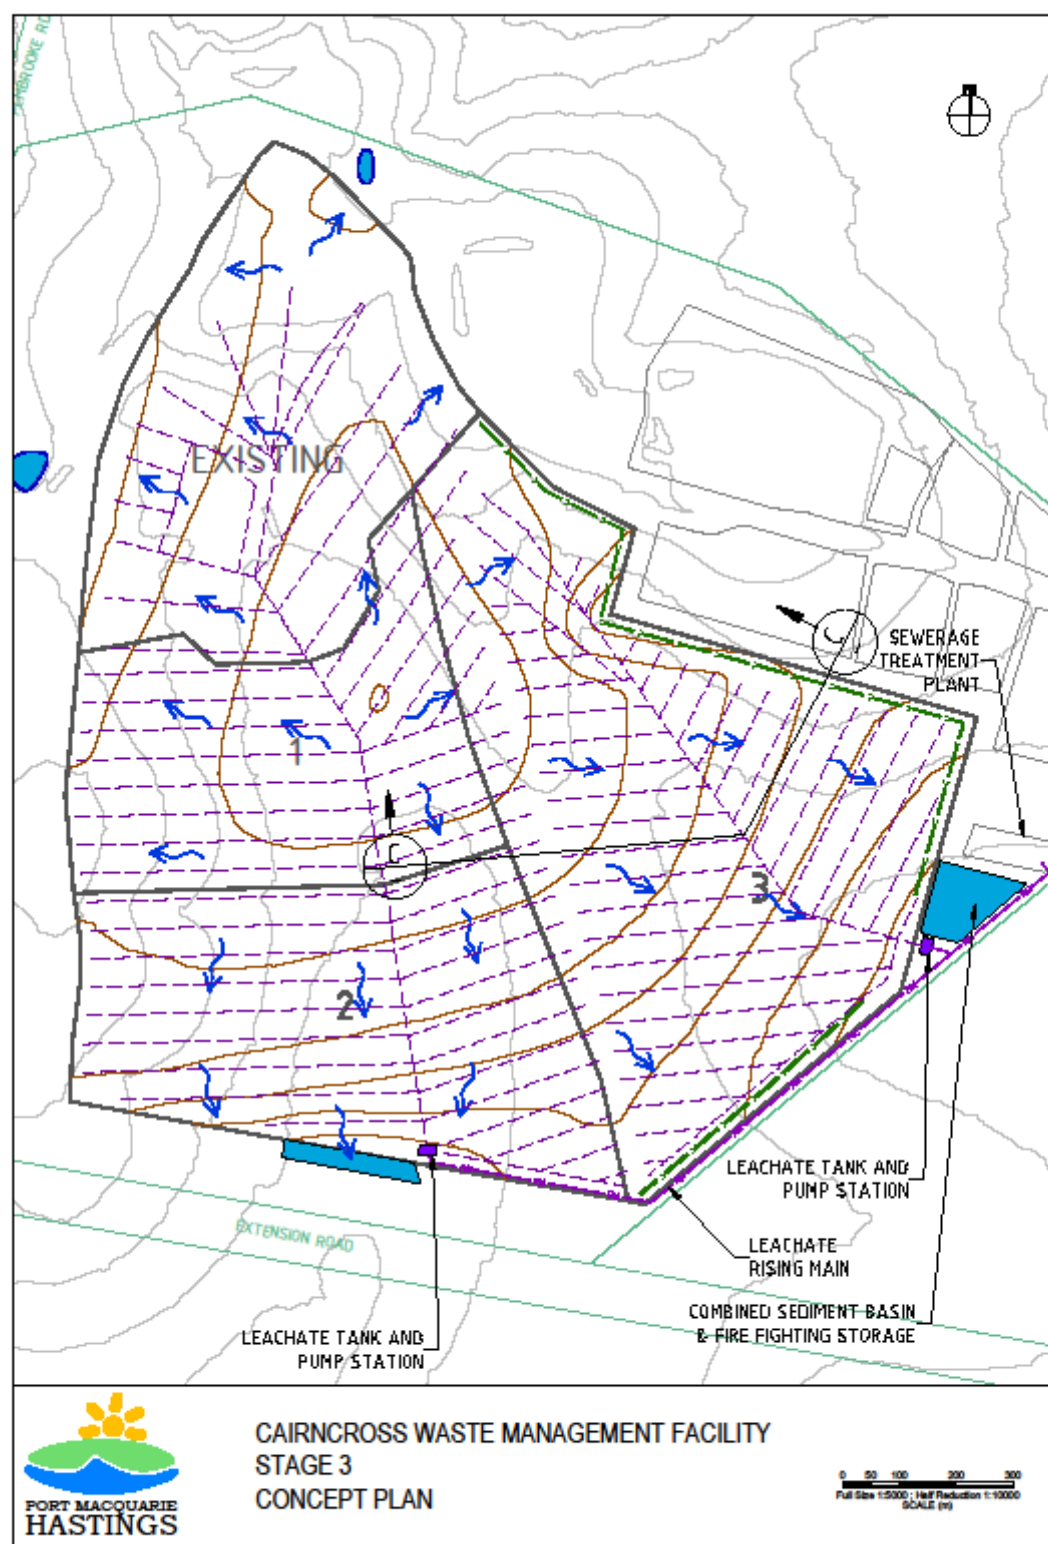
Proposed landfill layout and stages (Stage 3)
